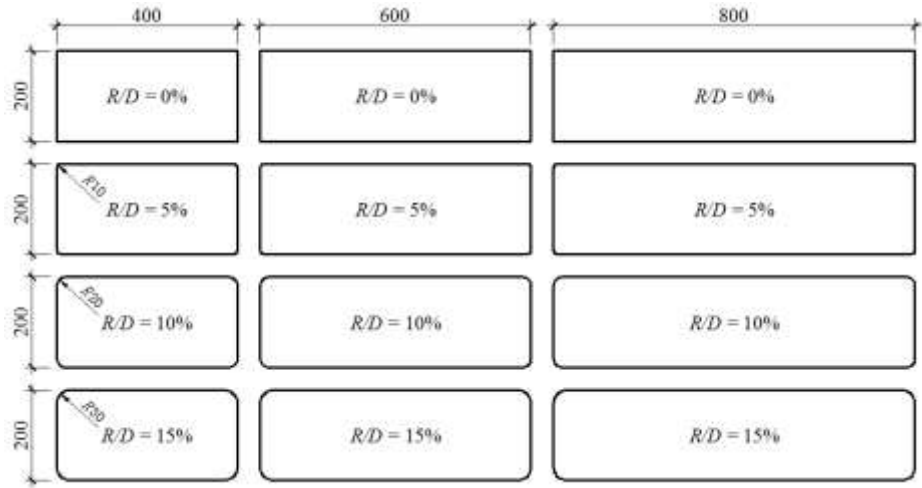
Sketches of the cross-sectional dimensions of models (Units: mm)
